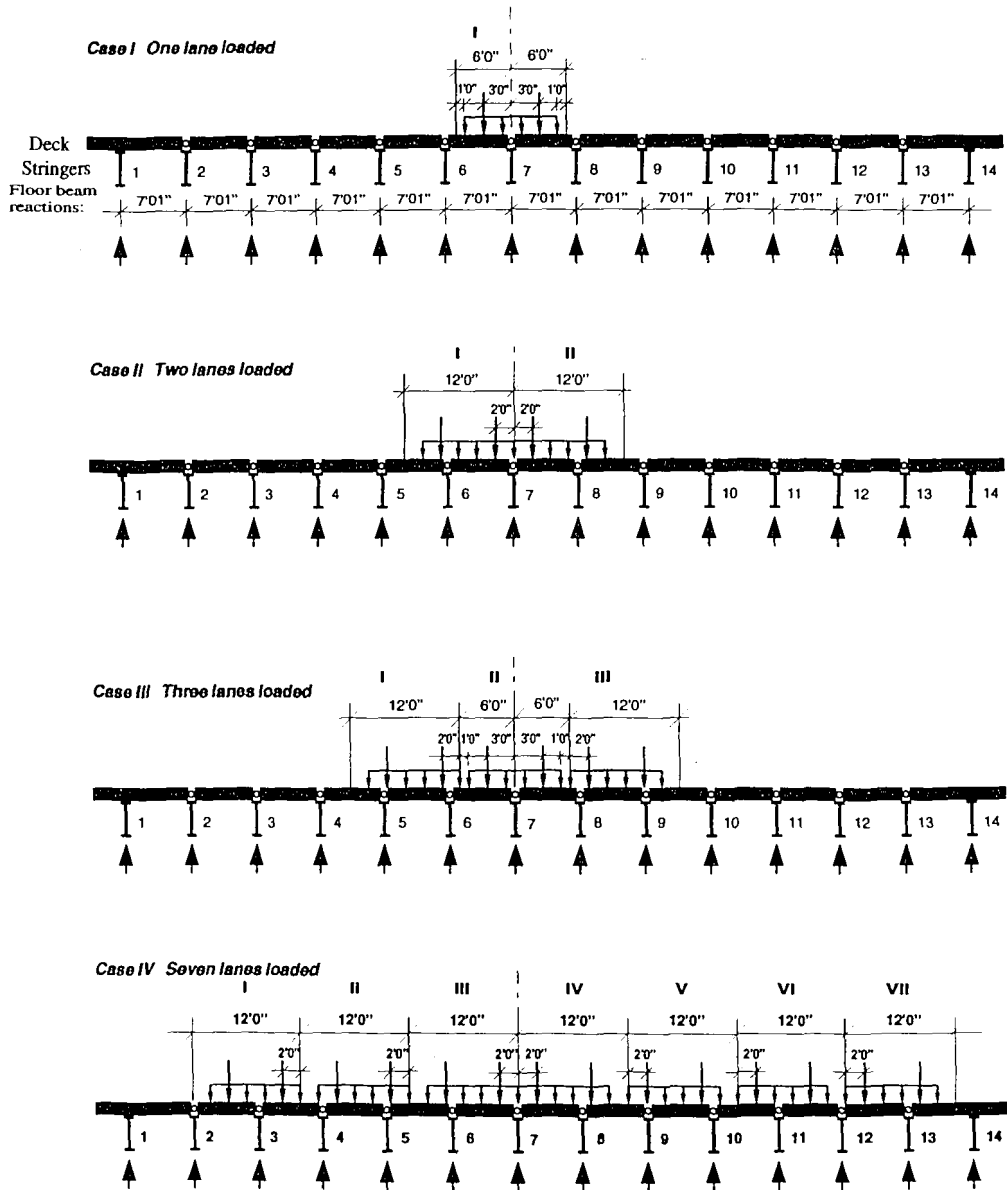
Transverse Live Load Positioning for Floor Beam Section No. 7
